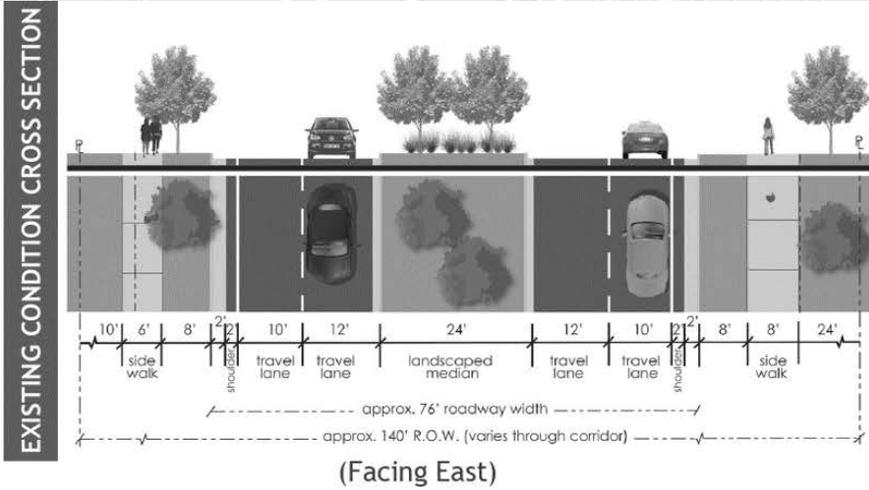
Cross Section Alternatives: Sheridan Blvd to Zuni St
